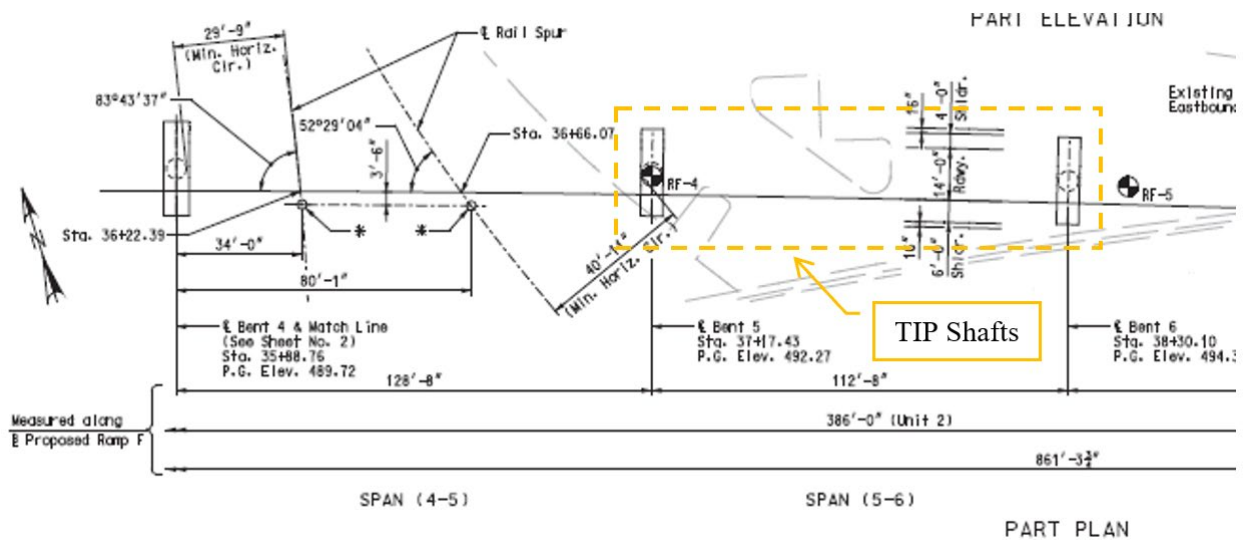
Partial plan view of Ramp F overpass bridge.
